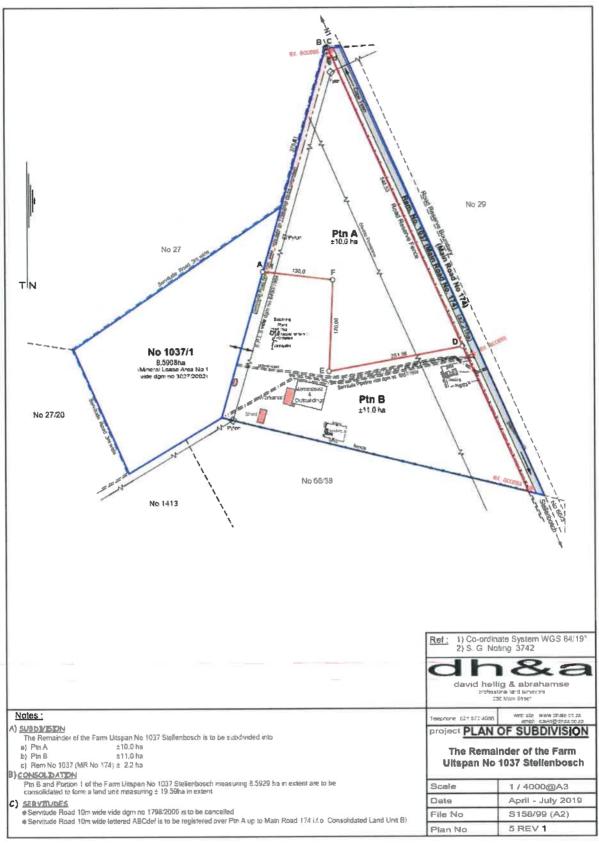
Site plan showing subdivisions of Stellenbosch Farm Uitspan No. 1037
